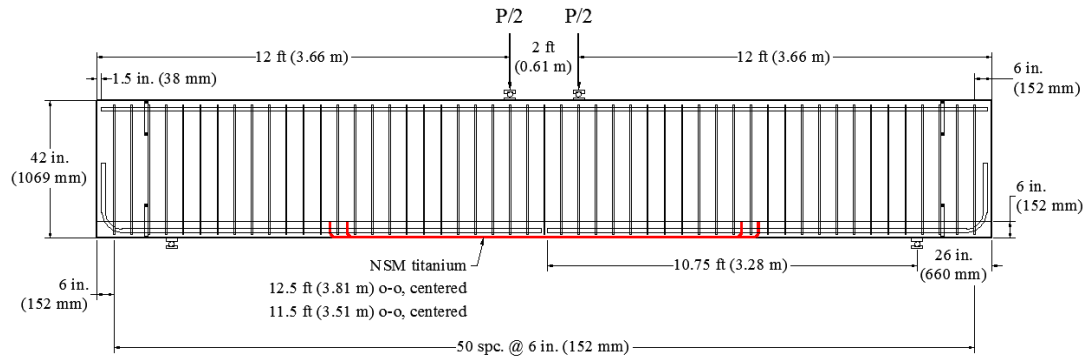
Elevation of specimen IT.0.0(6).Ti
